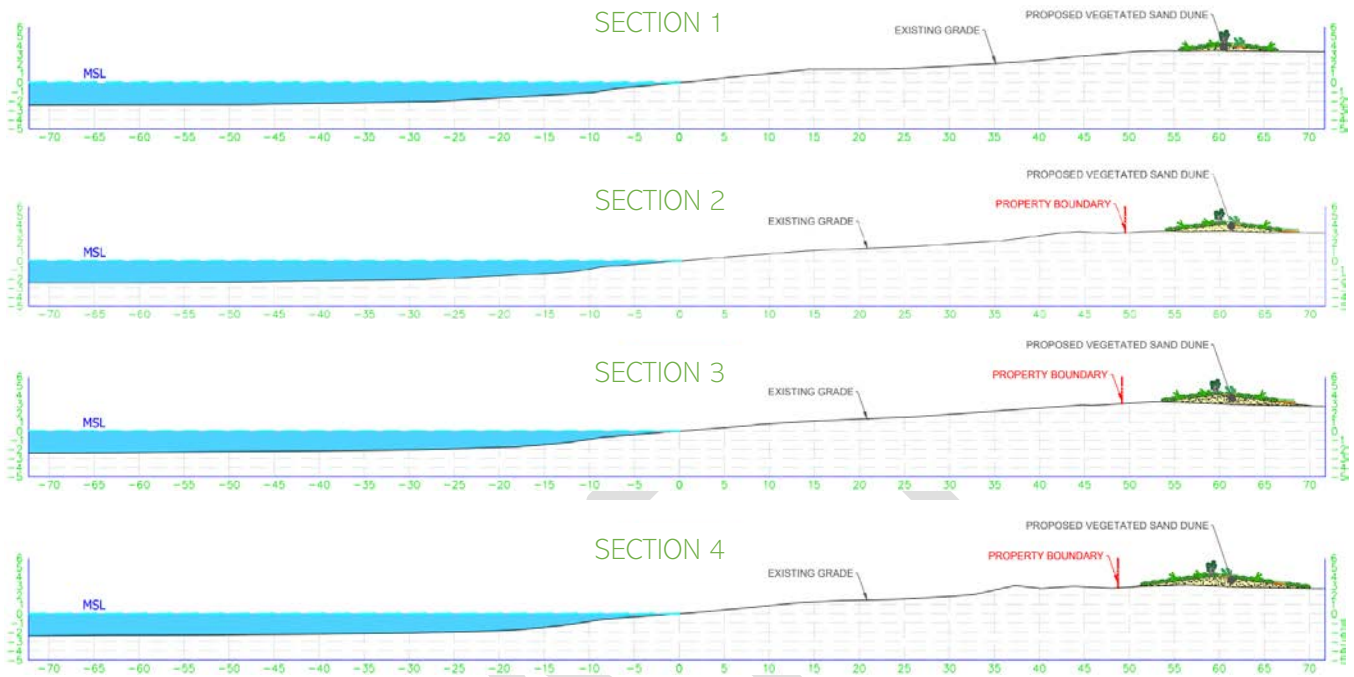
Concept sections for the proposed dune addition with section header matching section lines drawn in the plan
